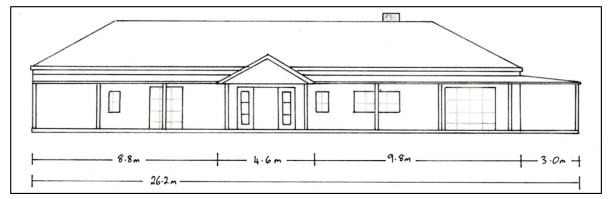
Dwelling West Elevation Plan (would be visible from Paps Lane)
